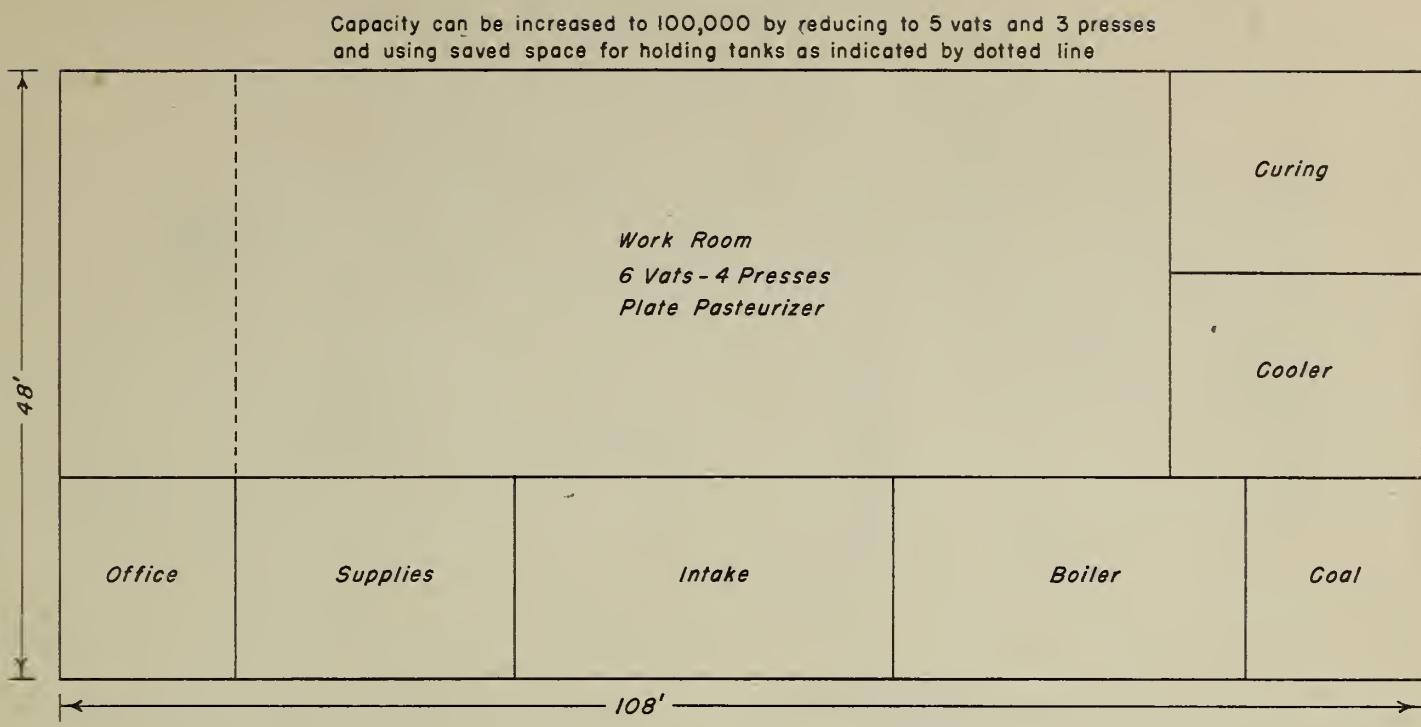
Suggested floor plan for cheese plant making 60,000 pounds daily. (Modification of Damrow plan II.)
